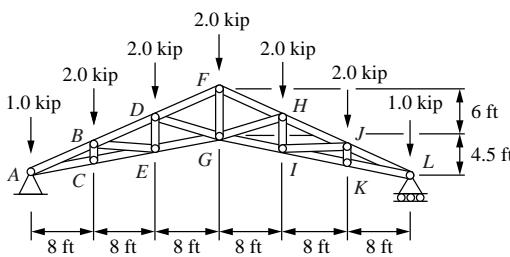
Howe scissors roof truss (FS = 2.0)
